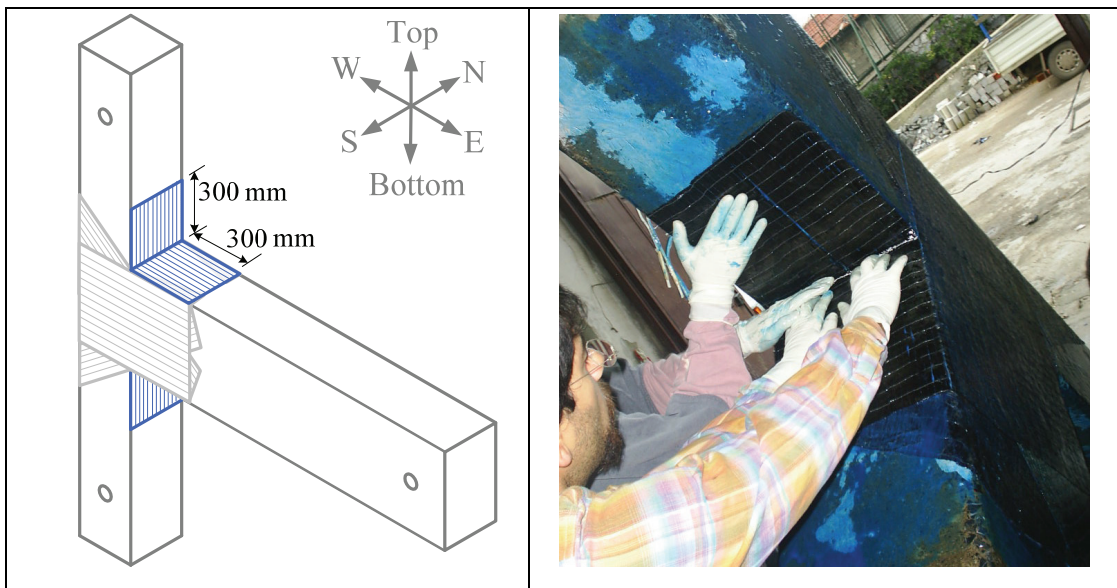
L-shaped CFRP sheet application, step (iii)
